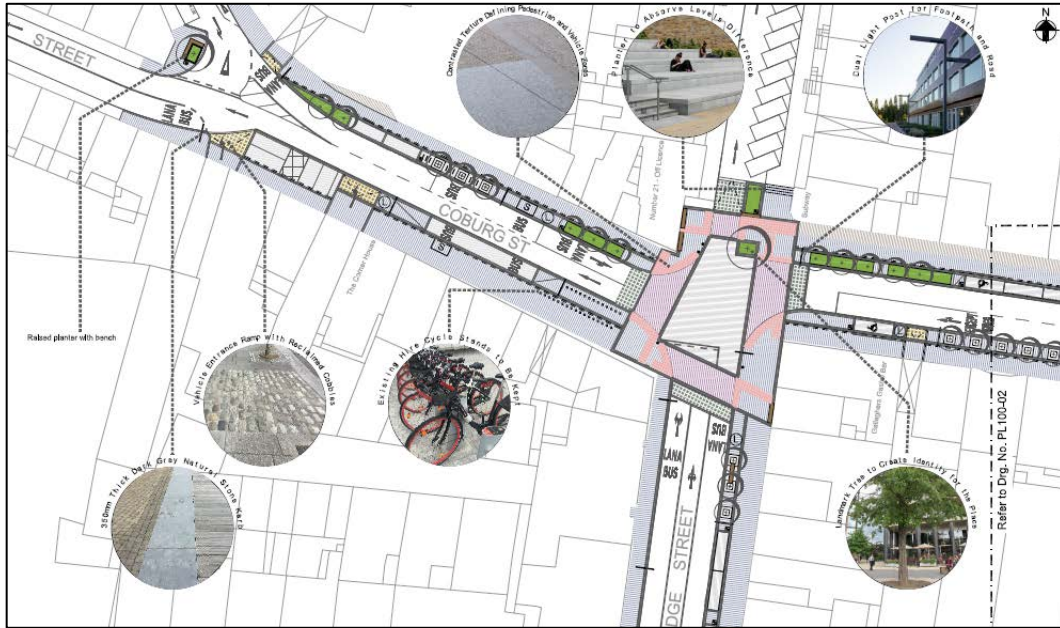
Public realm proposals for Coburg Street and Bridge Street | Not to Scale
